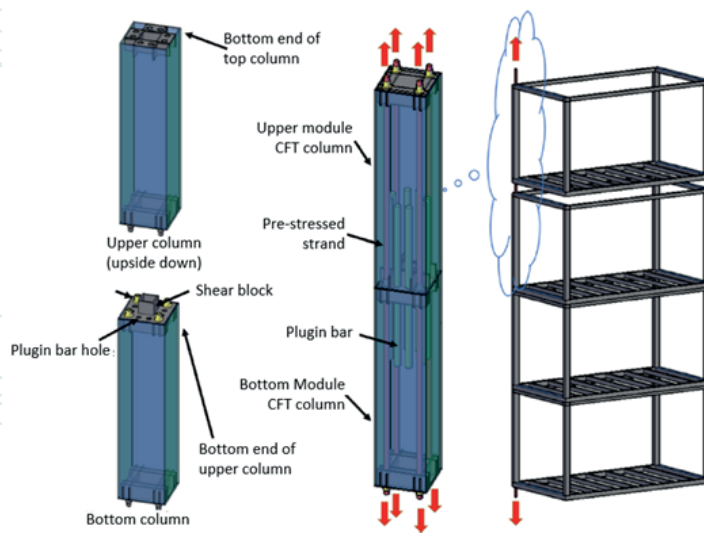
Construction detail of pre-tension connecting using bolted connection with plug-in device
